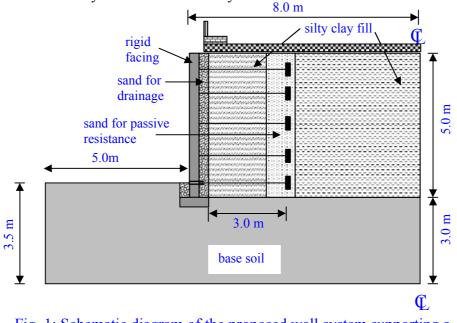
Schematic diagram of the proposed wall system supporting a roadway.
